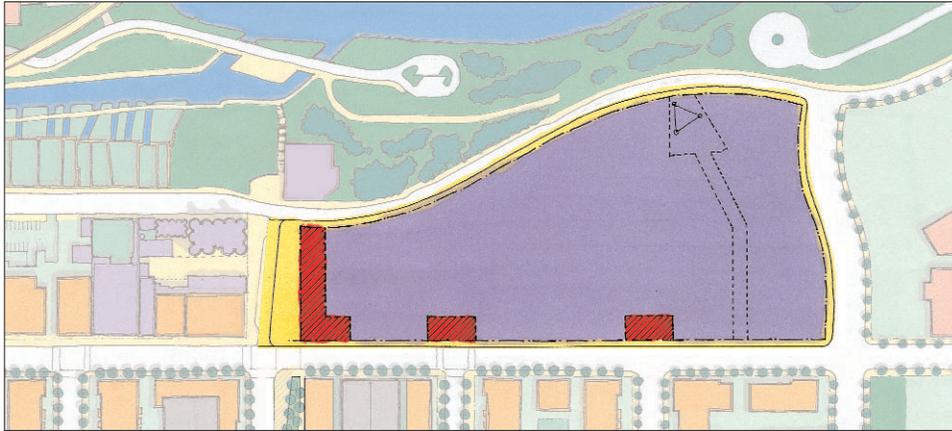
Primary Pedestrian Entry Points: The Plaza, 9th Avenue, and 10th Avenue. Note that additional secondary entry points elsewhere are acceptable
